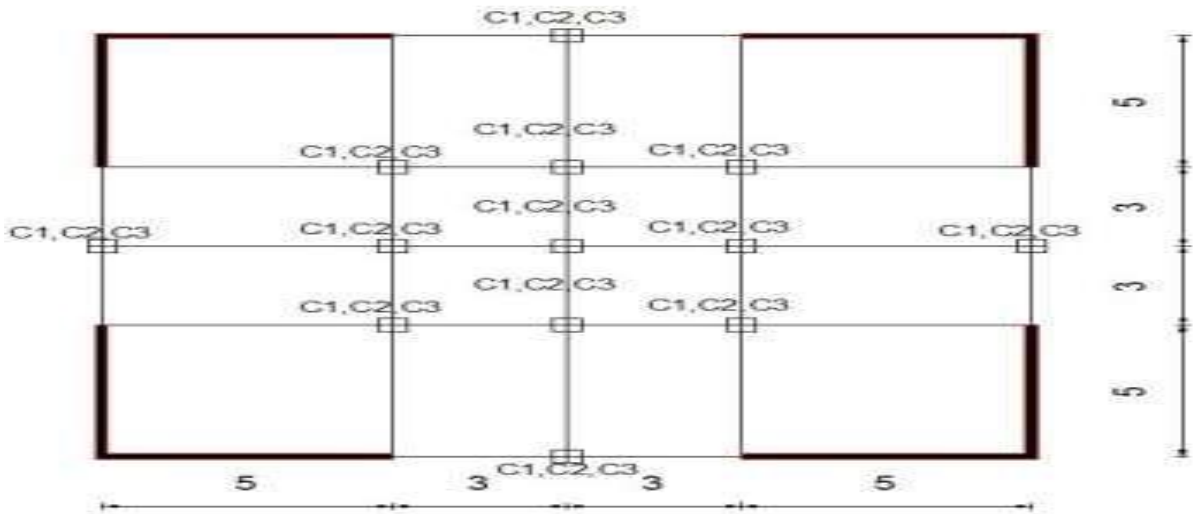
Shear Walls at Corners (M.S. Ainawala Et Al., 2014)
